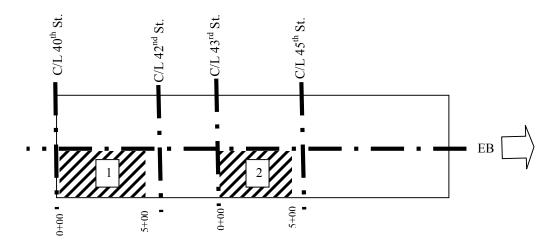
UBWC Test Sections on Table Mesa Dr., Boulder
